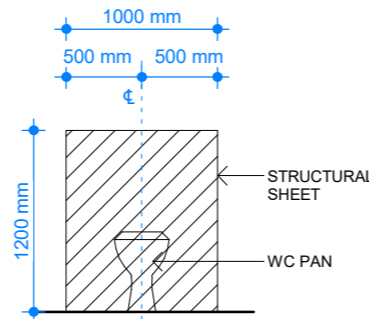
LOCATION OF SHEETING FOR A WALL BEHIND A TOILET PAN
